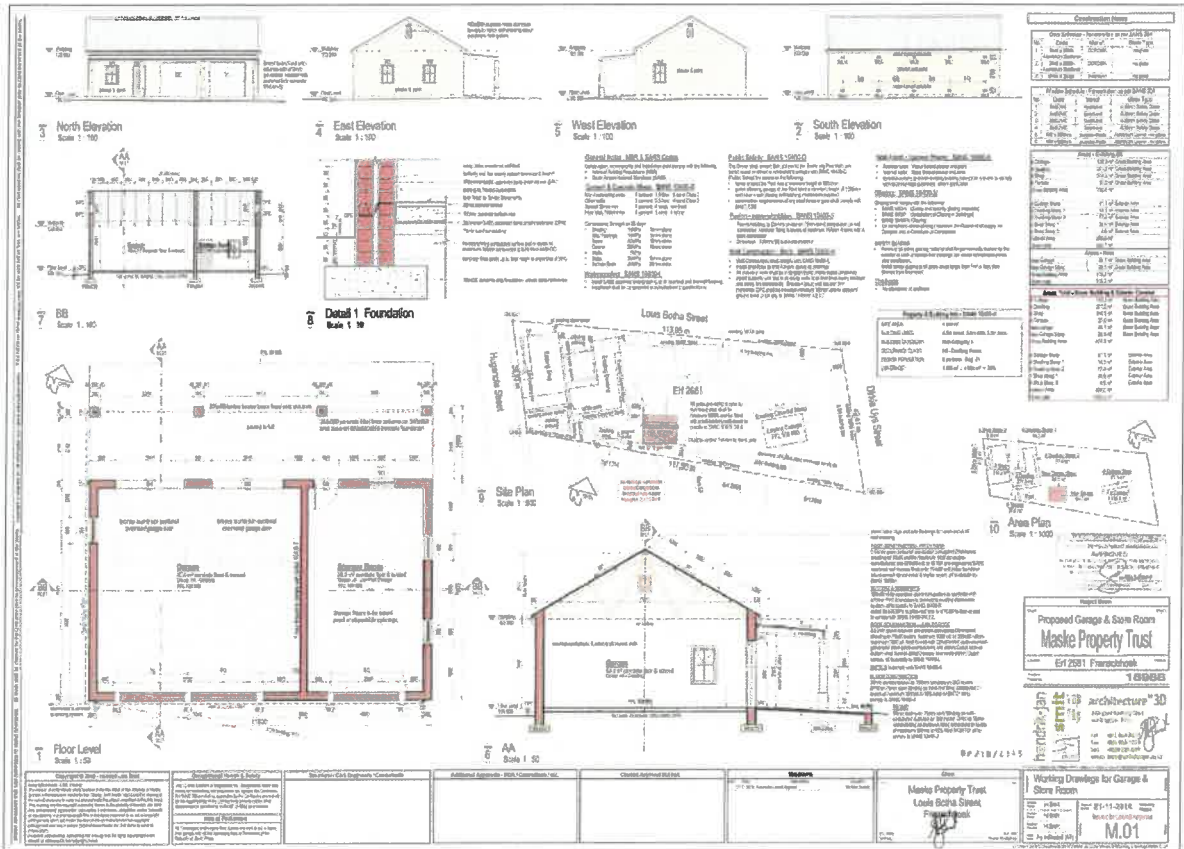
and 8: Building Plans in respect of Elevation and Section Plans
